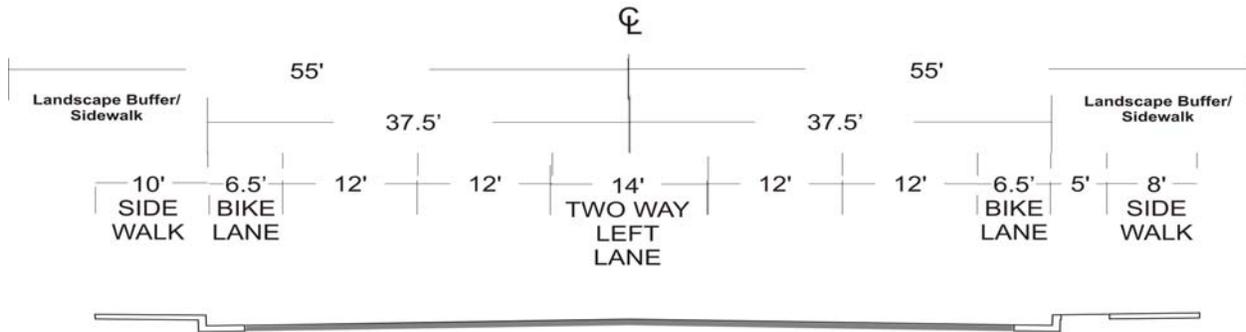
TYPICAL CROSS-SECTIONS
